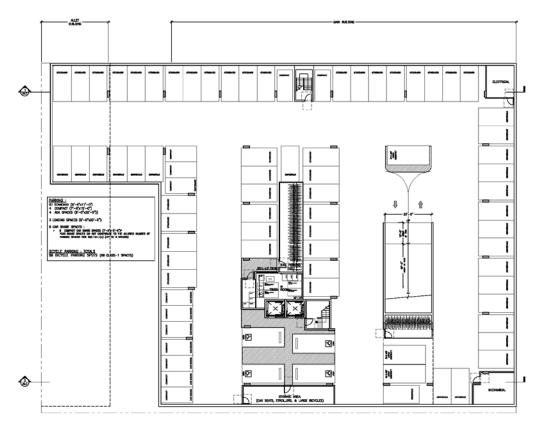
Basement Plan (Natoma Street Driveway Option)
